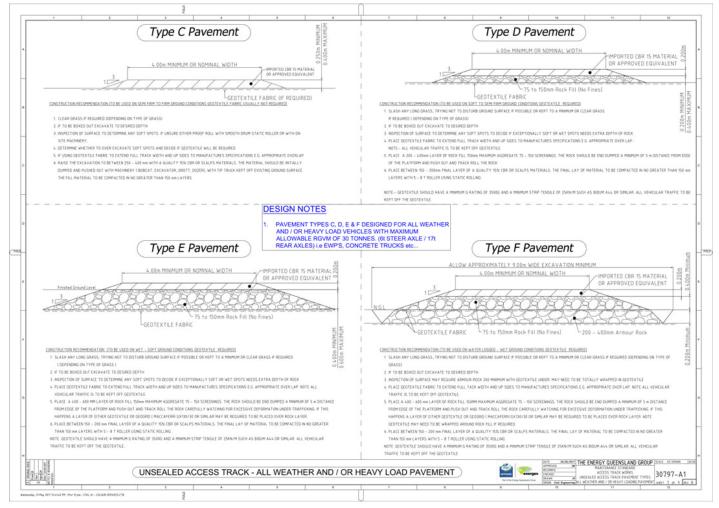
Access Track Infrastructure - All Weather And / Or Heavy Vehicle Loads - Access Track Pavement Types.
